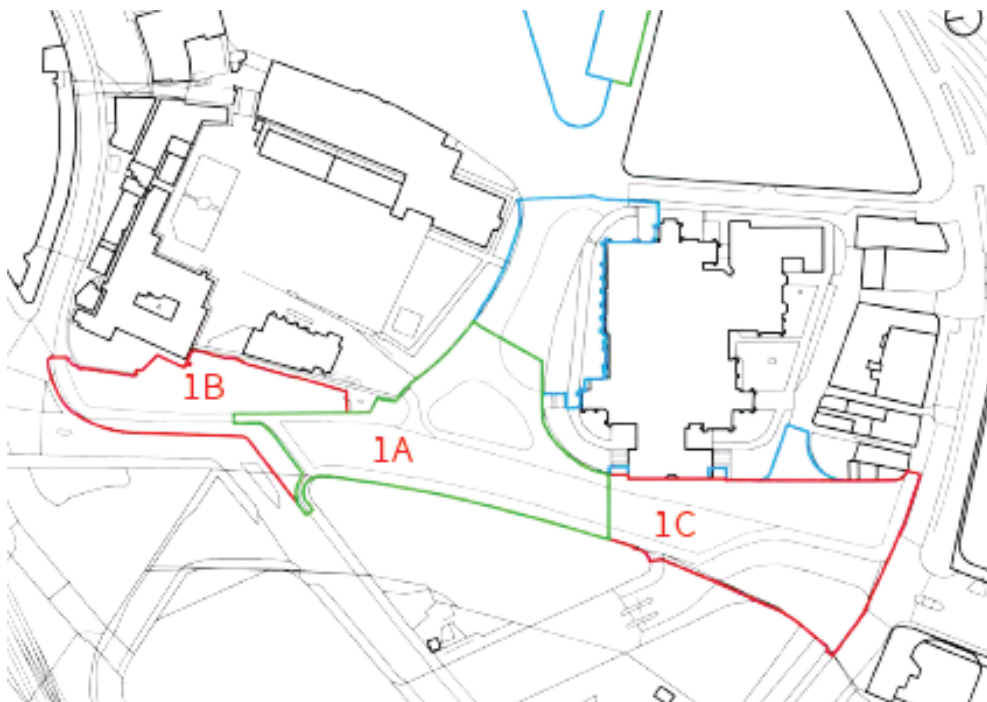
SIMPSON HAUGH MASTERPLAN
